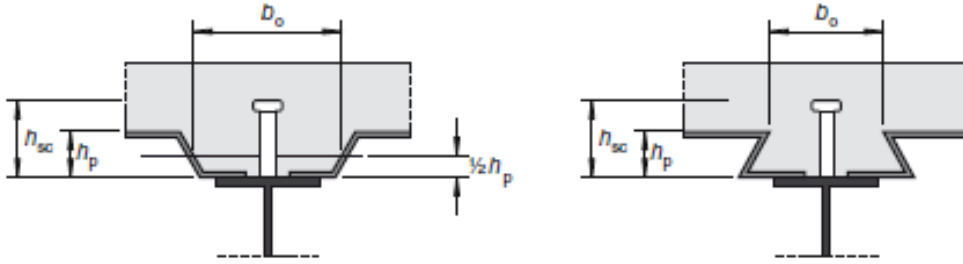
Beam with profiled steel sheeting parallel to the beam
